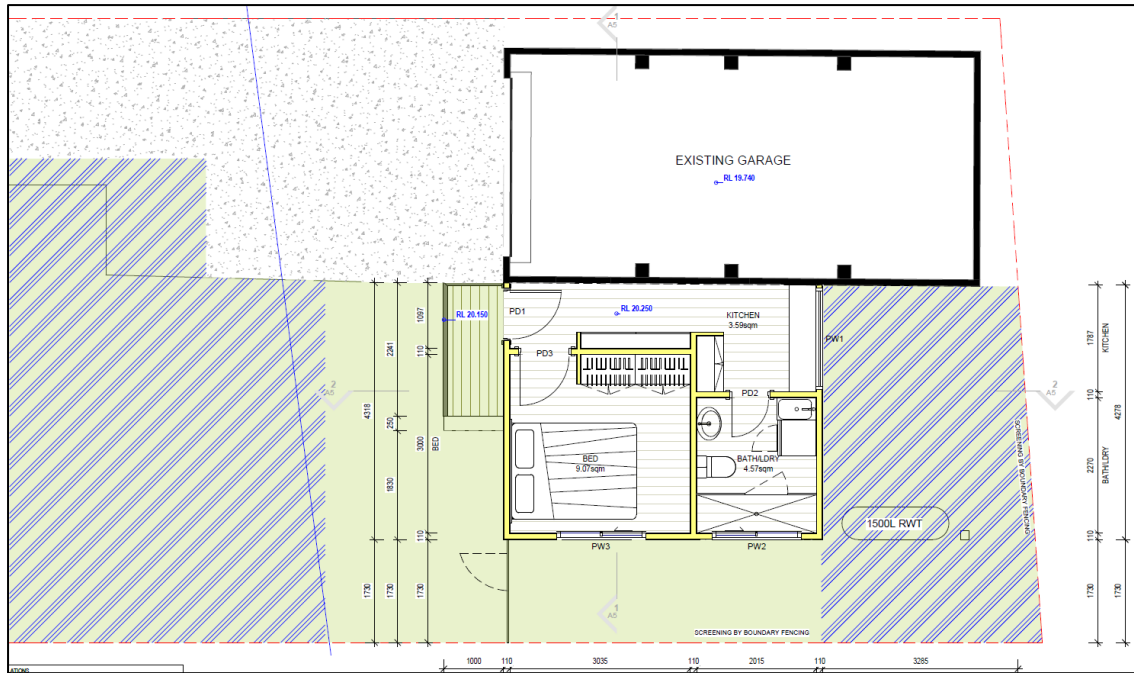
Proposed Secondary Dwelling Ground Floor Plan
